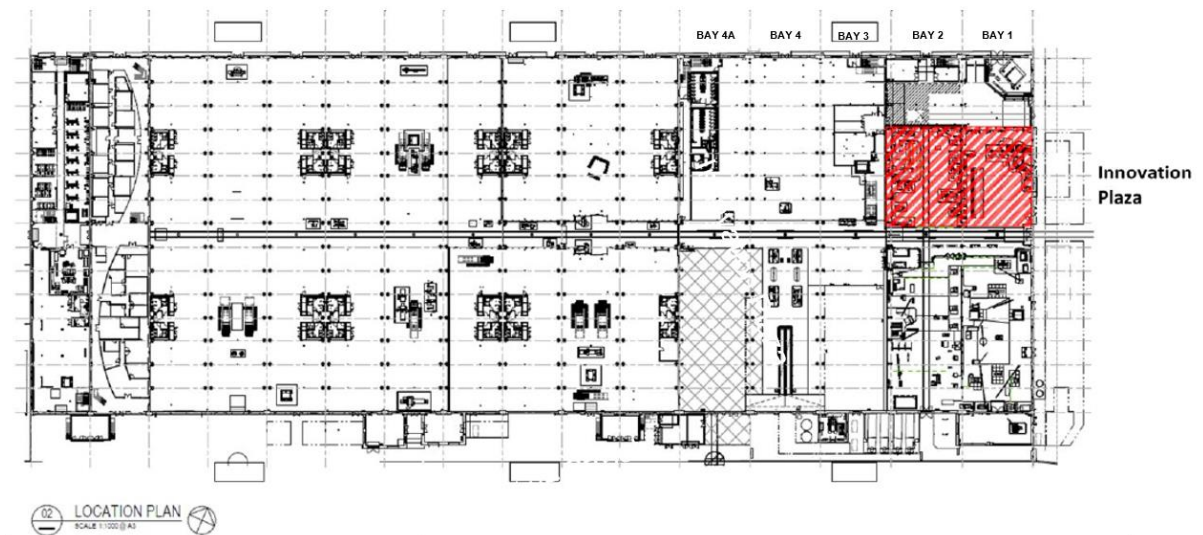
Site plan showing subject tenancy within Bays 1 and 2 (north) of the Locomotive Workshop
